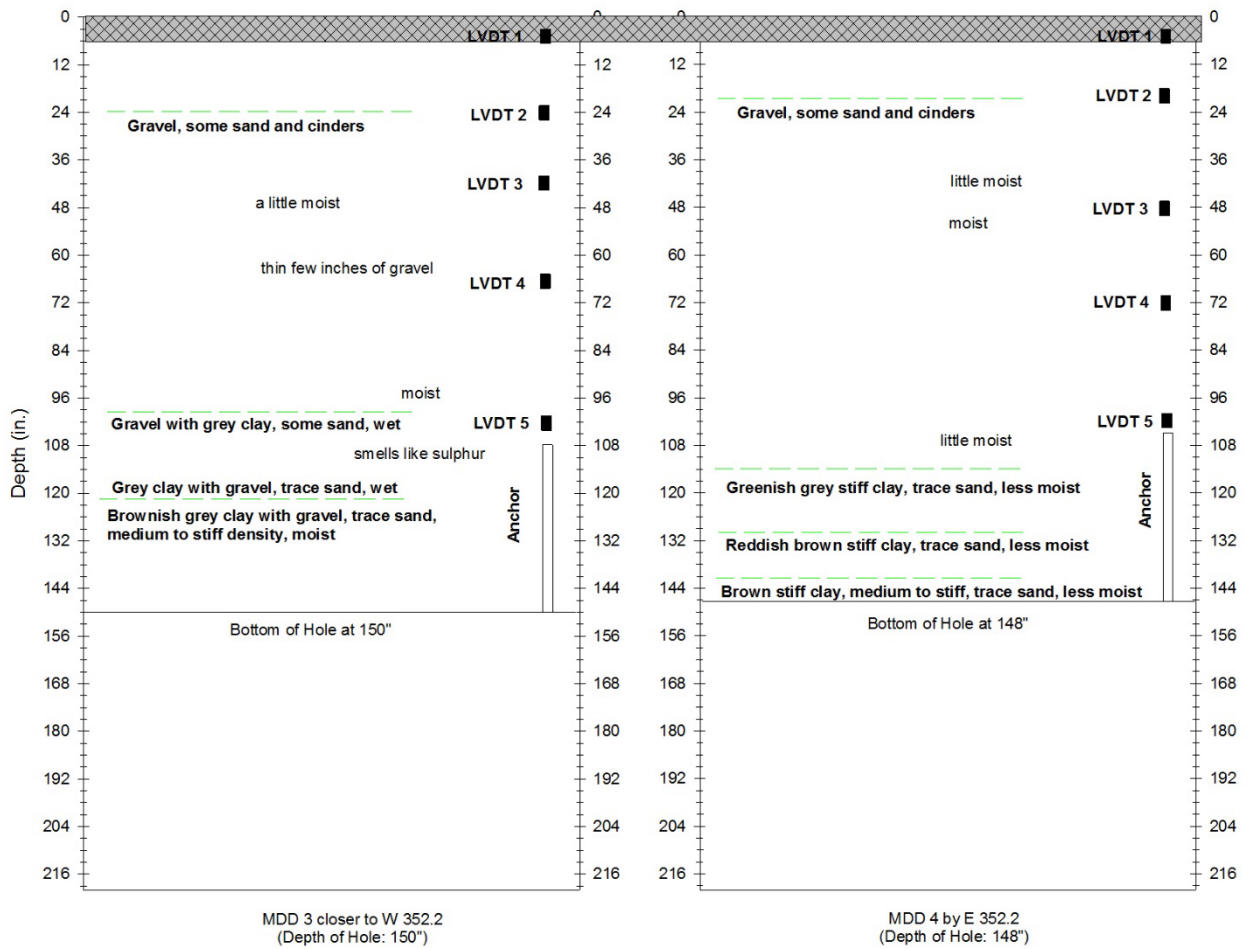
Track Substructure Layer Profile at Bridge MP352.2 West Approach
